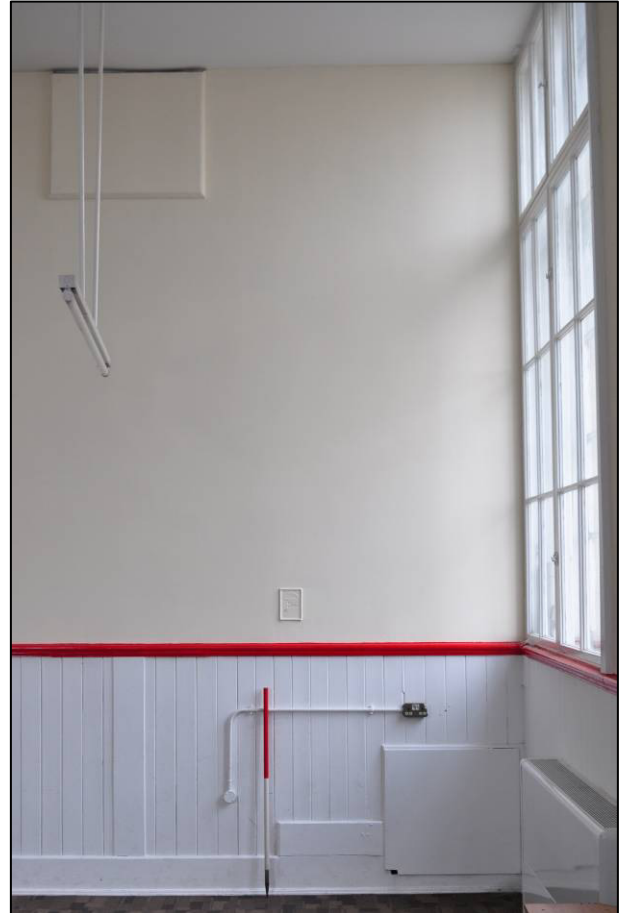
1895 Higher Board Boys' School, classroom (1F15), covered vents and control plate to west wall, looking W (photo 2261).
